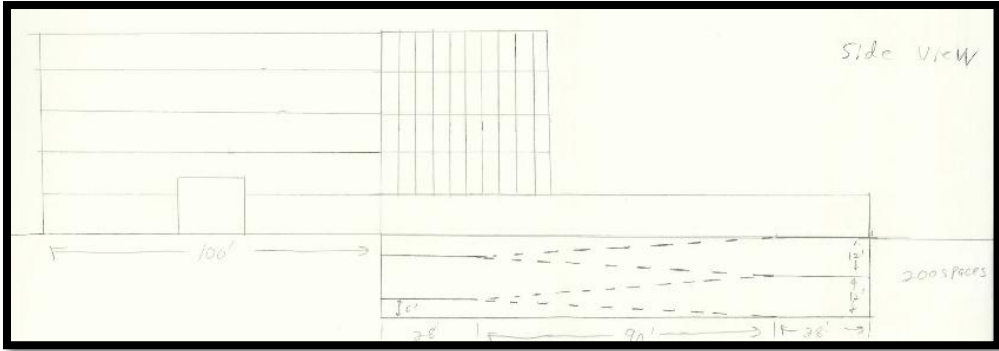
Underground Parking Garage and Green Roof with Adjacent Academic Building Option
